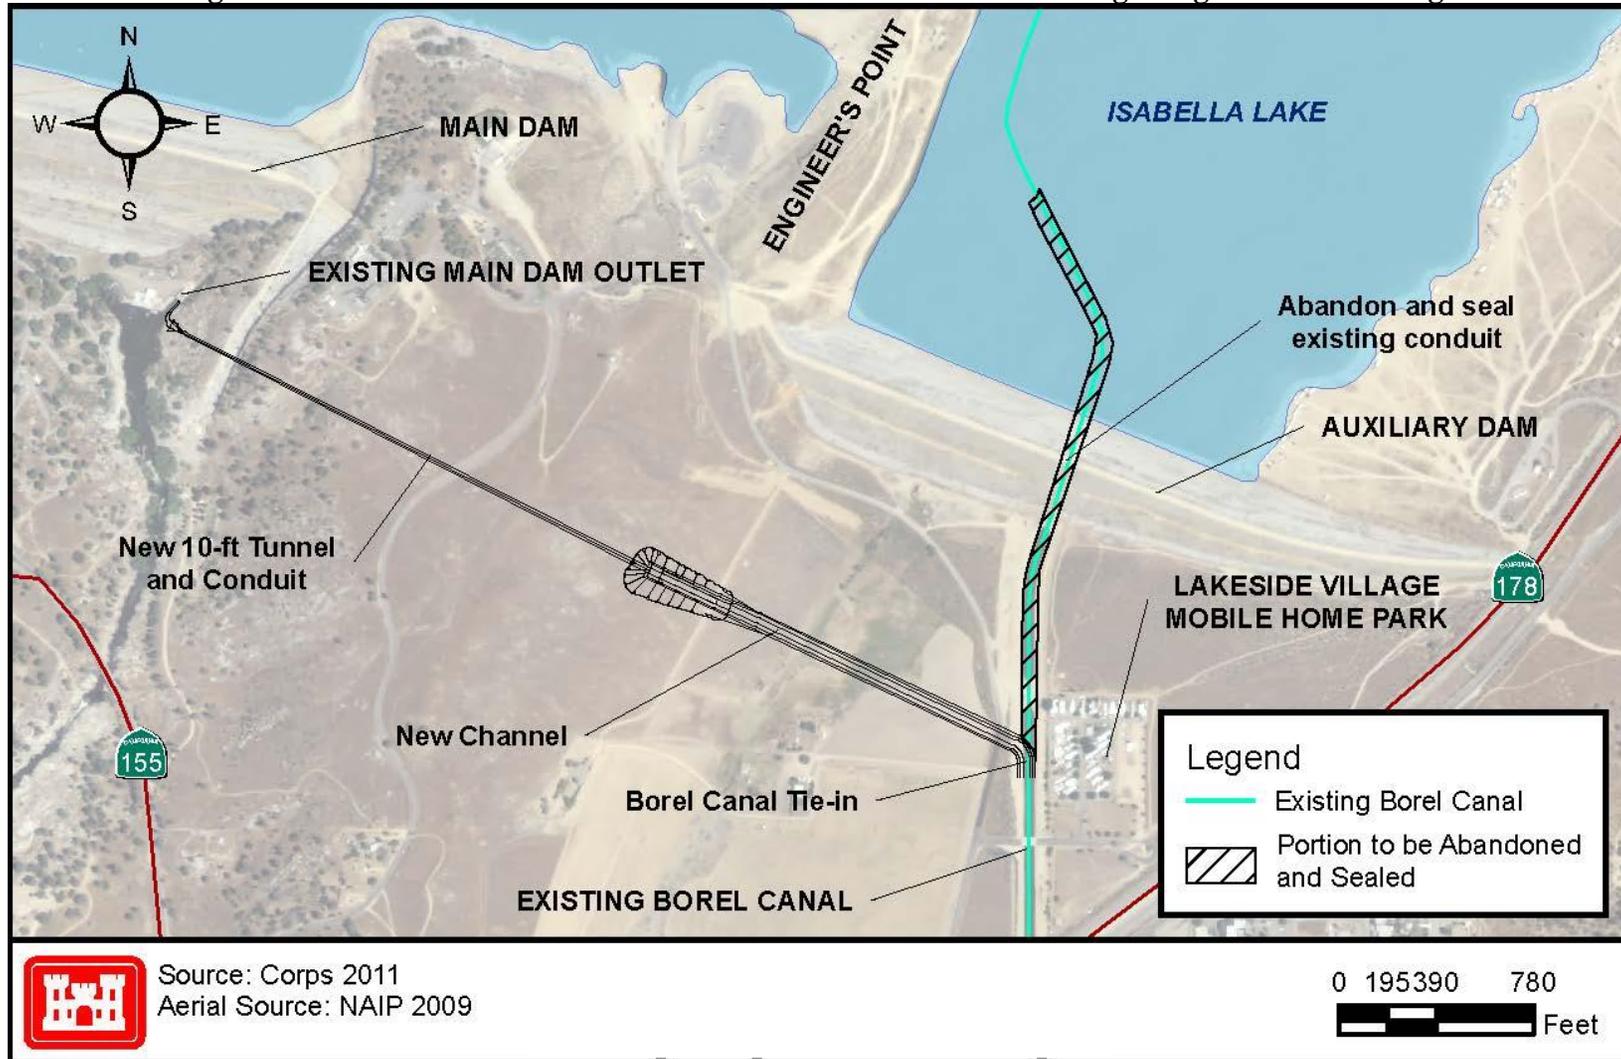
Plan View Sketch of Auxiliary Dam Remediation Measures (Alternative Plan 4)
